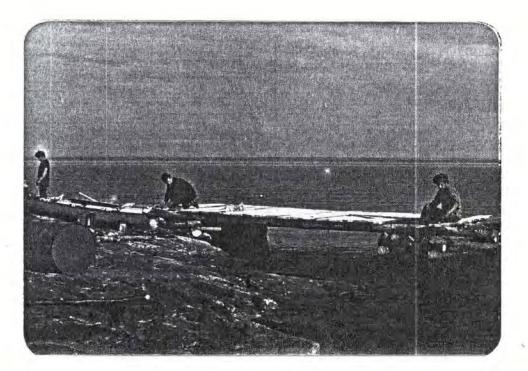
(negative # 17) Building dock on Cypress Point, June 1975 (Project 71 - 41)
